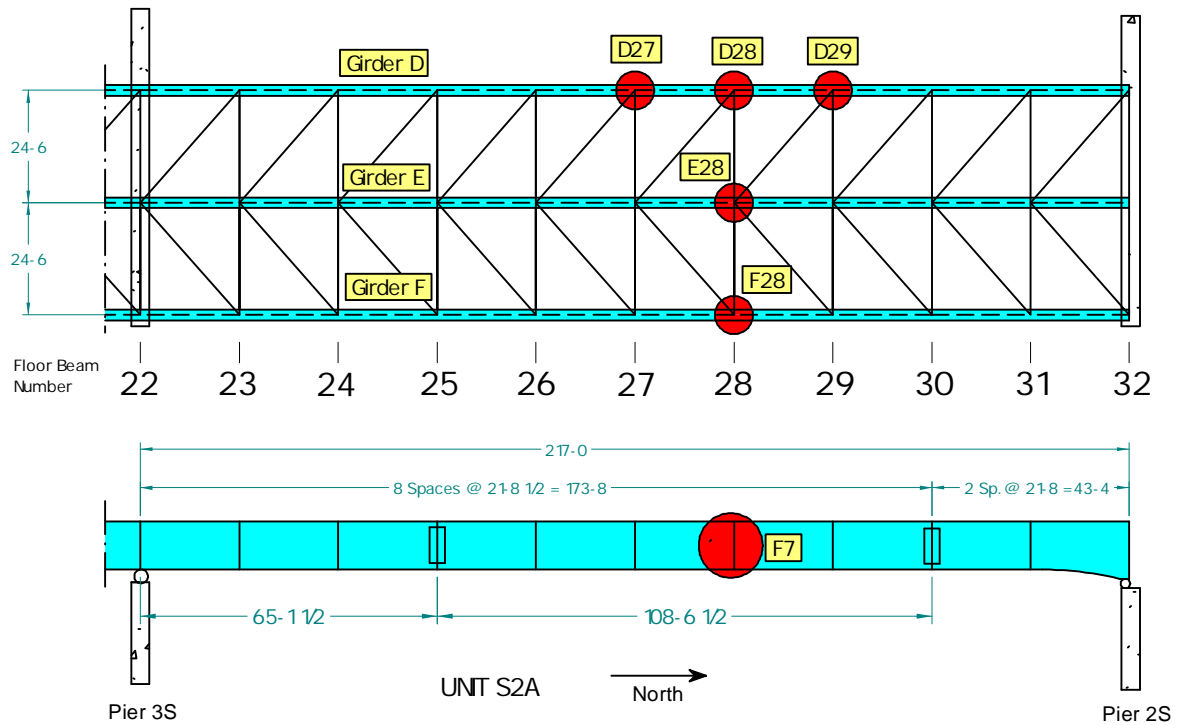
Framing Plan and Elevation of Fractured Span
